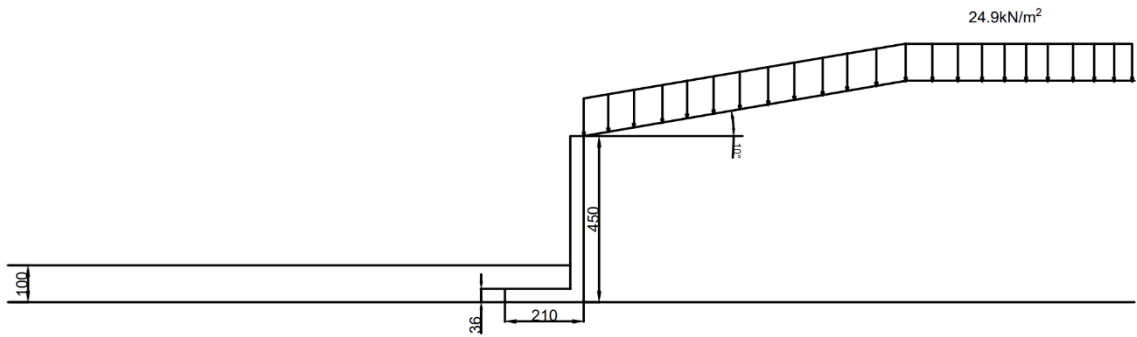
Geometry of retaining wall with backfill slope 10°
